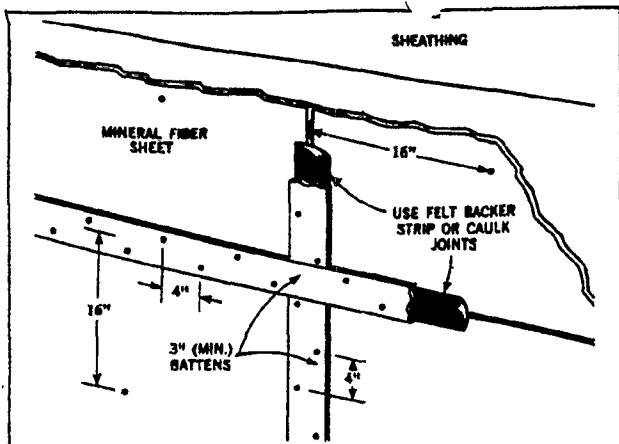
BATTENED JOINTS - Either caulk at sheet joints or use a felt backer strip over sheet joints behind battens. Stagger nails through battens on 4 in. centers, straddling the sheet joints.
